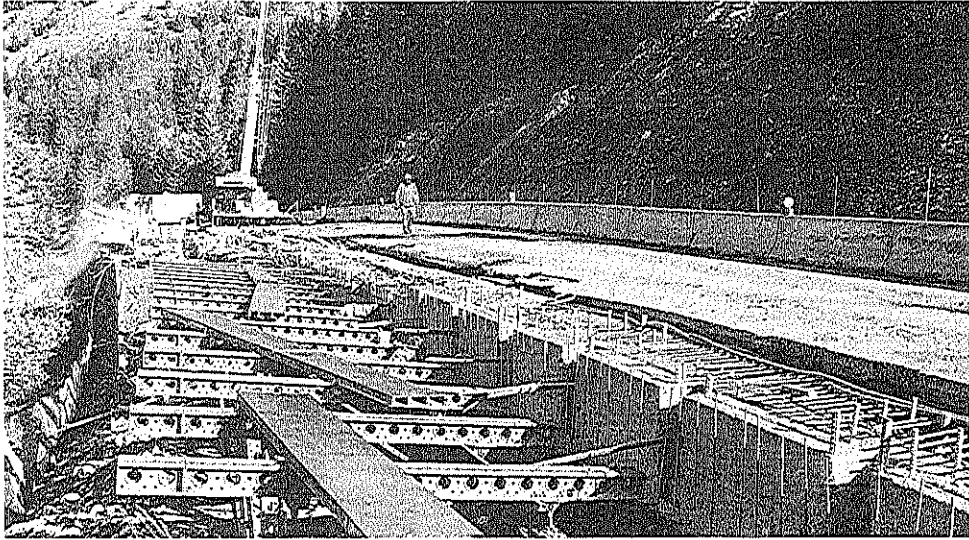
Goat Lick Slide. Cap beam (on right) with cutout notches for ground anchors. The girders (left, center) provide support for the roadway cantilever section.
